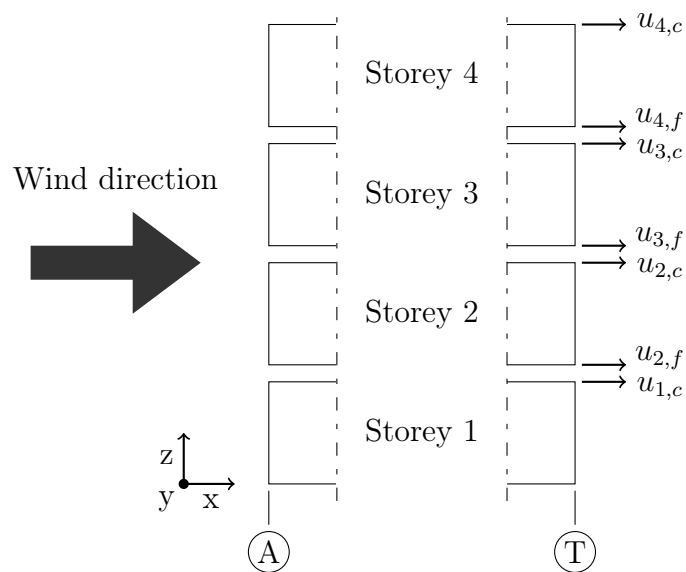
Illustration of displacement measuring positions in the ceiling truss (u_c) and floor truss (u_f).
